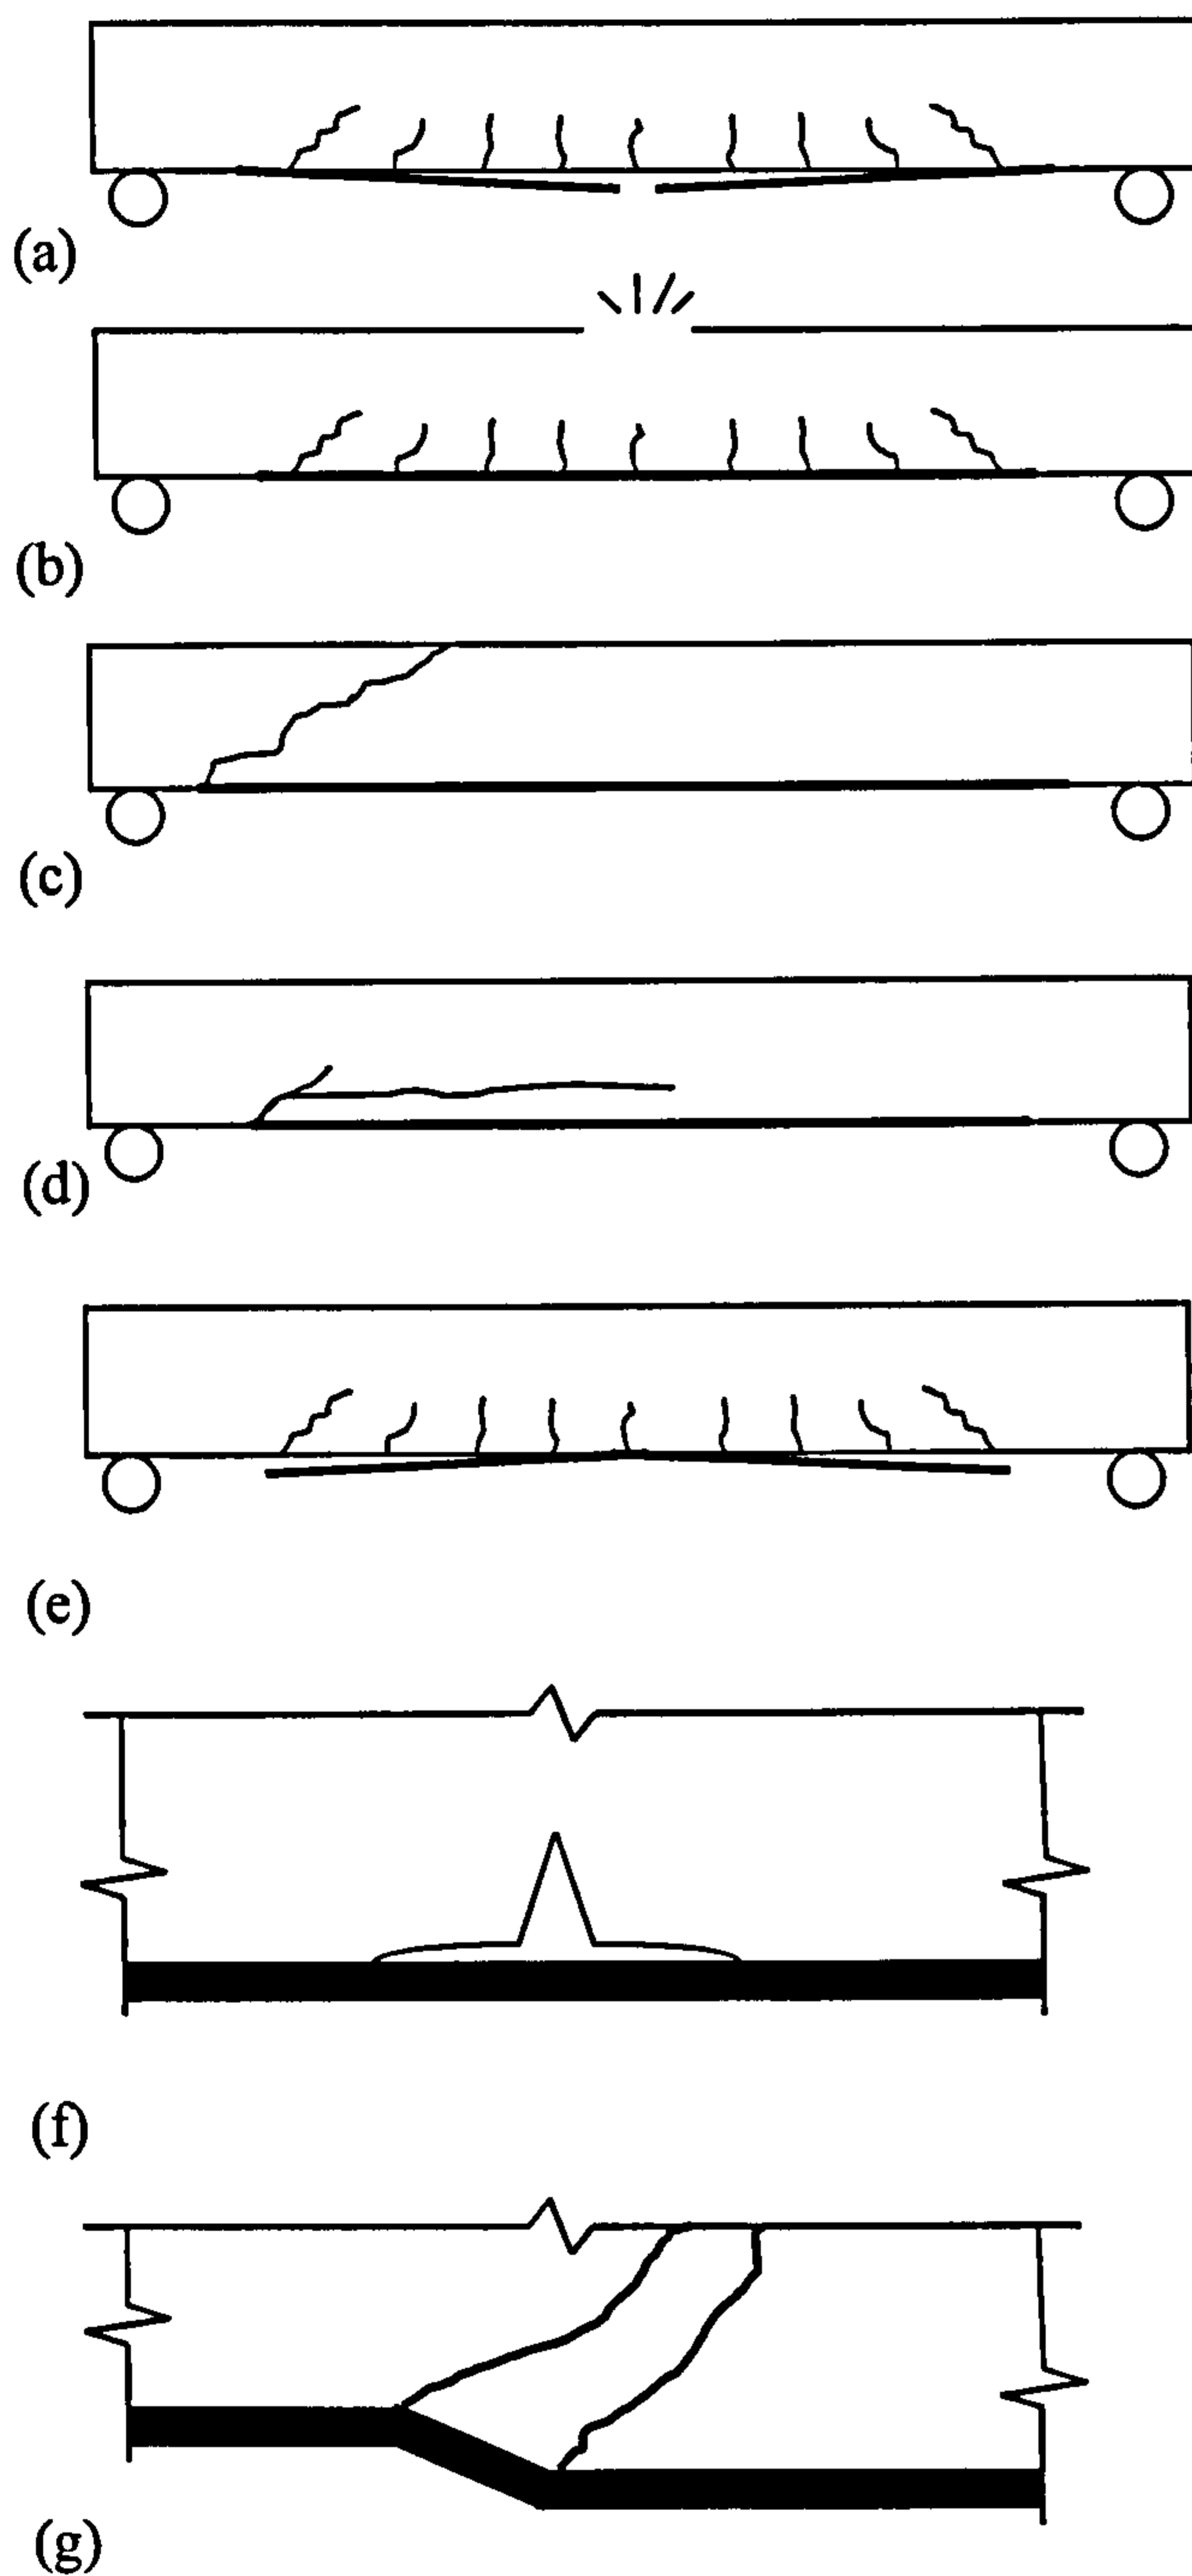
Failure modes in FRP retrofitted concrete beams
